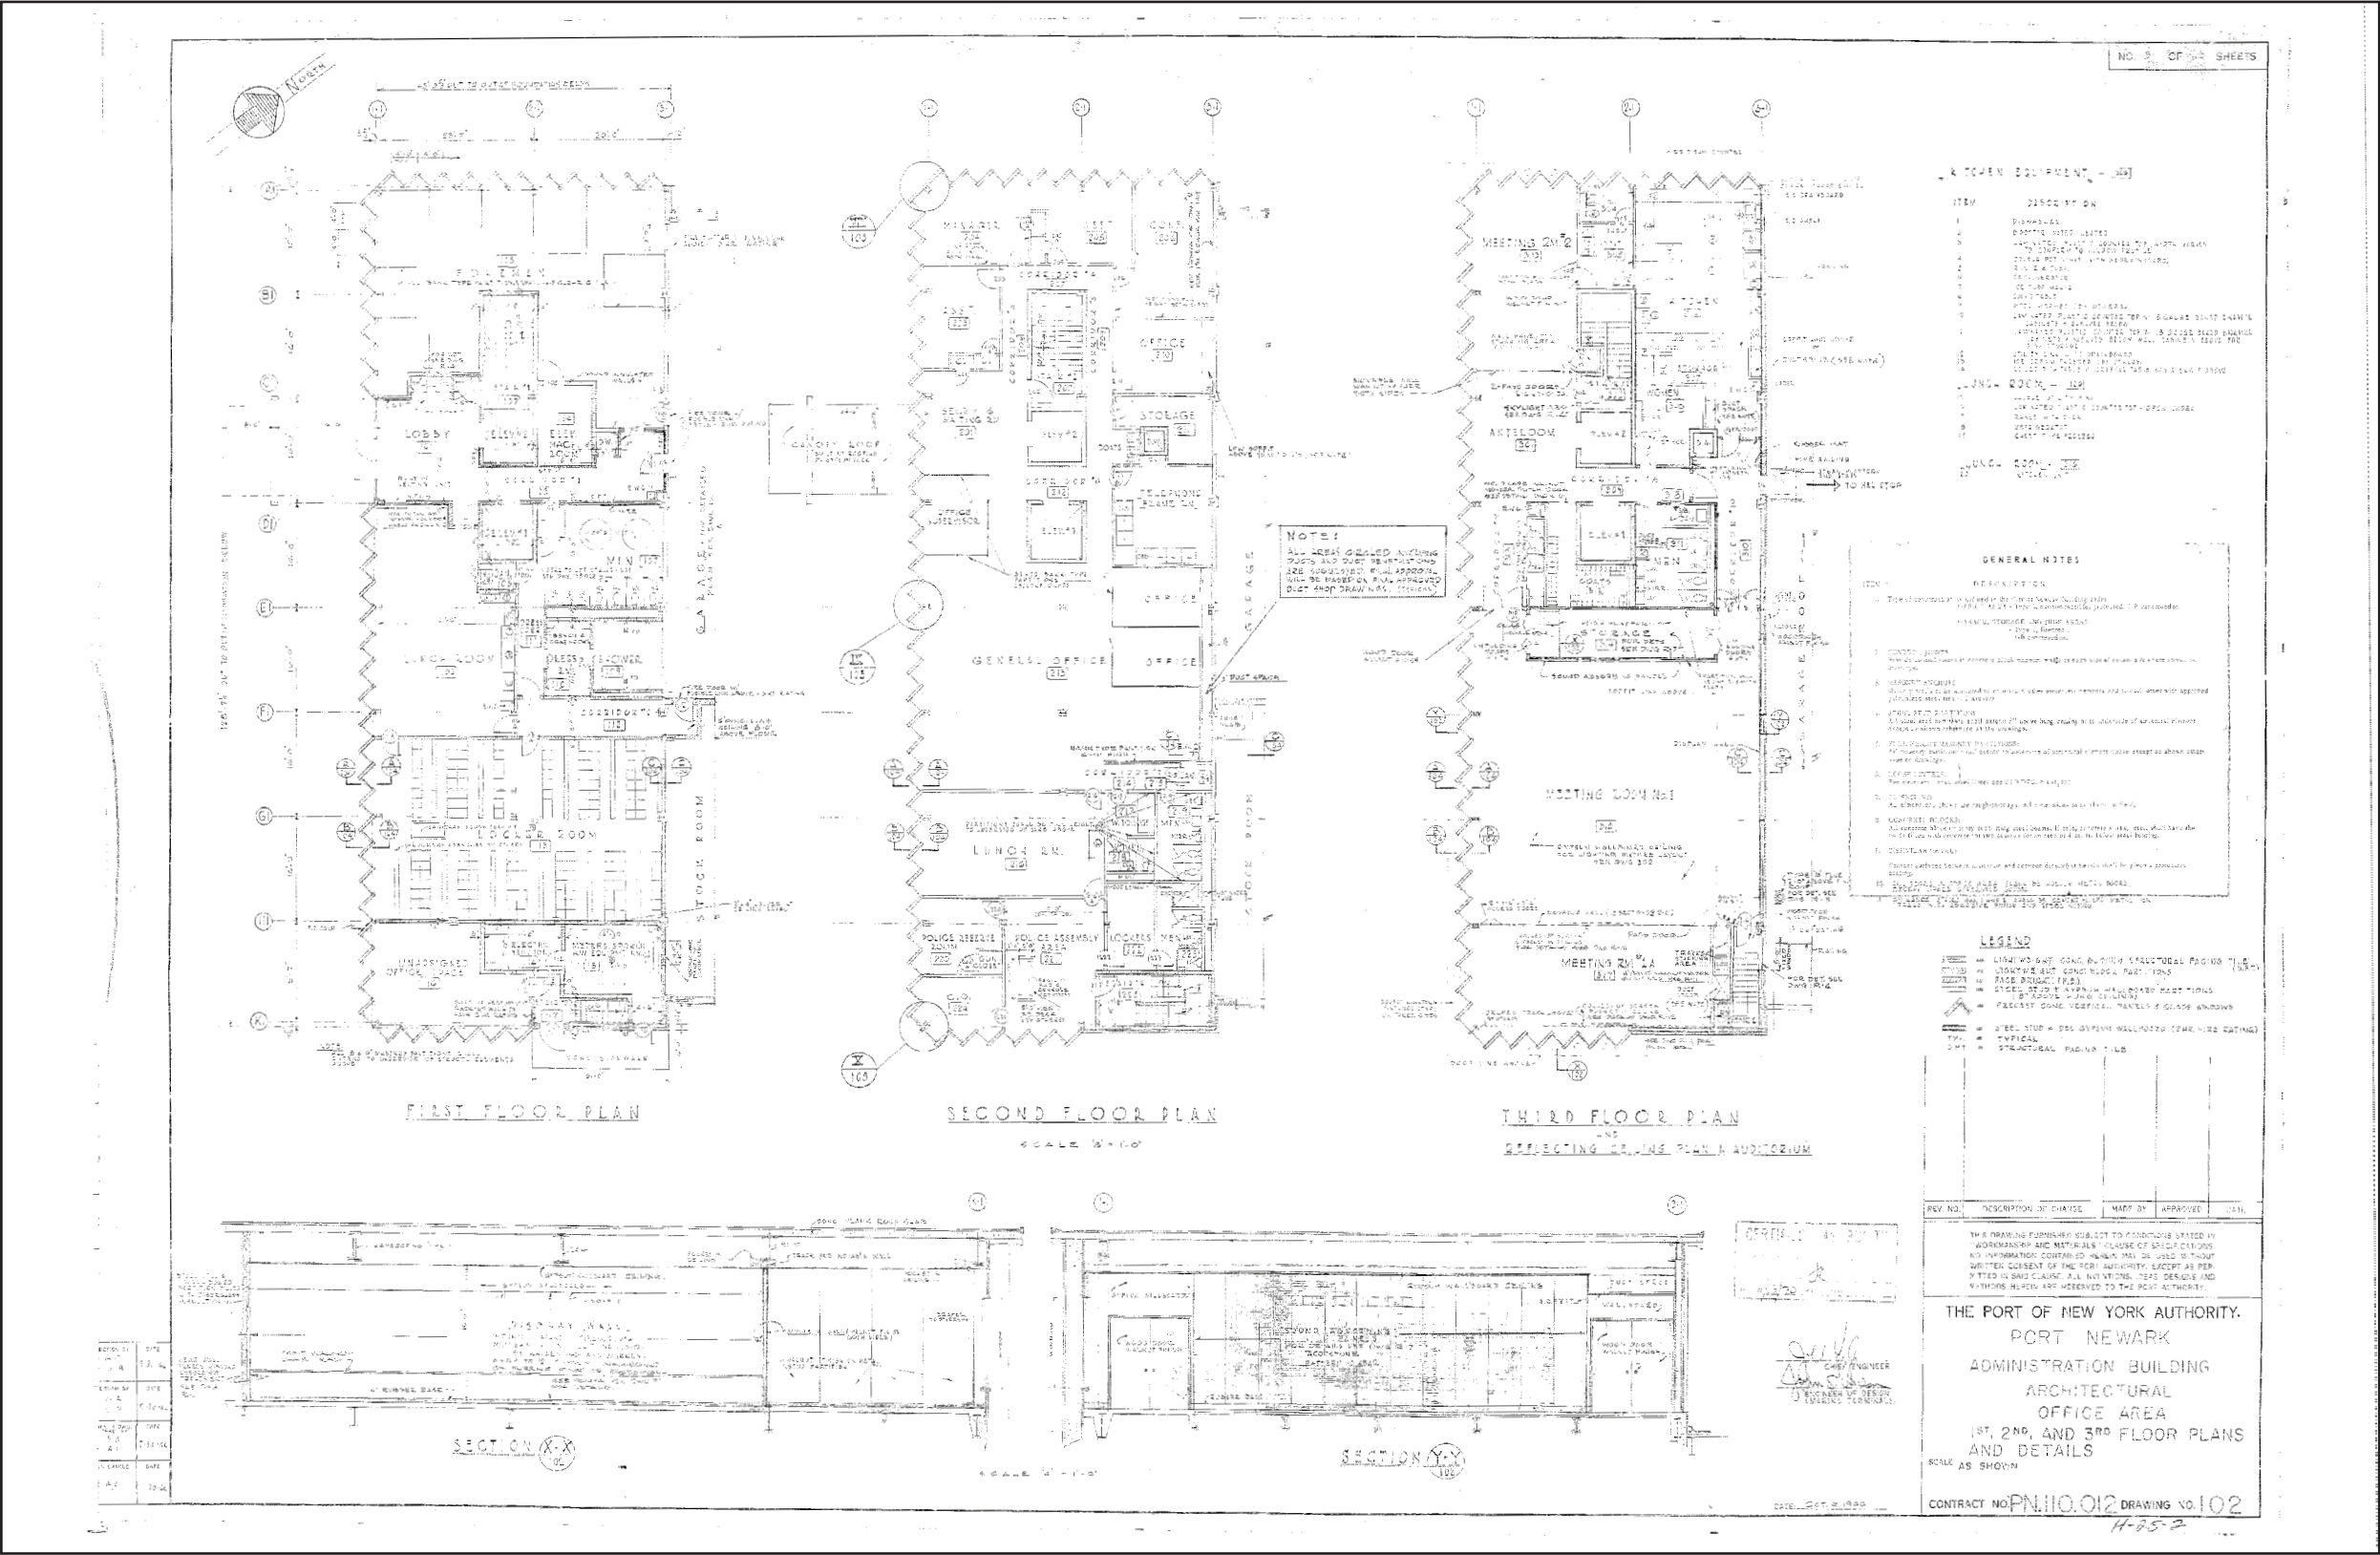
1966 architectural drawing depicting the three floor plans and two sections of the office area of the Port Authority Administration Building (Building 260) (Source: Port of New York Authority 1966).
